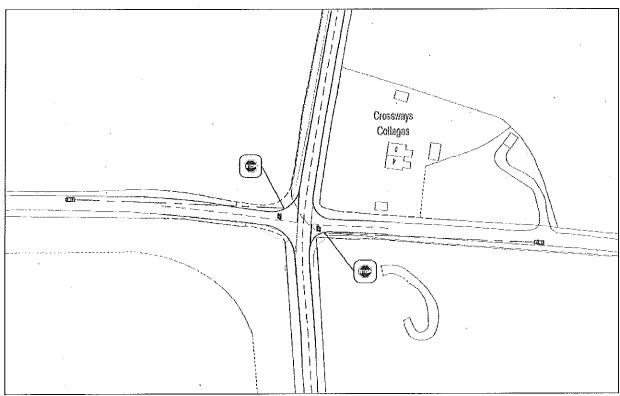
Proposed modified junction layout AECOM drawing 60445024-SKE-C-008-A
